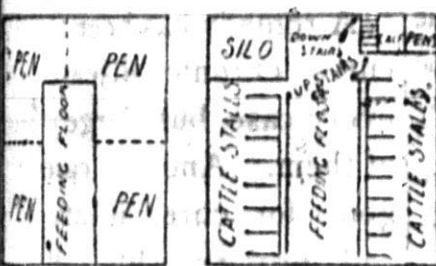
FLOOR PLAN. FIG. 3.—FLOOR PLAN FOR DAIRY BARN.
